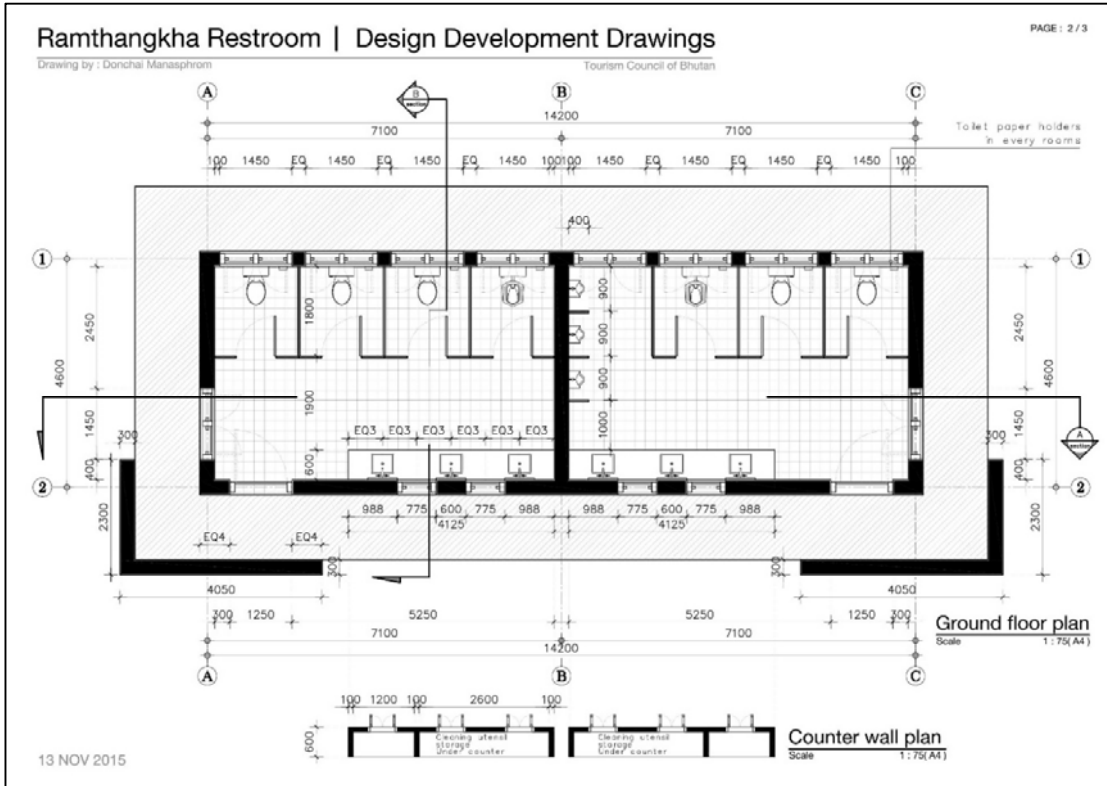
Renovation drawings of Ramthangkha (Taksang base) restrooms
